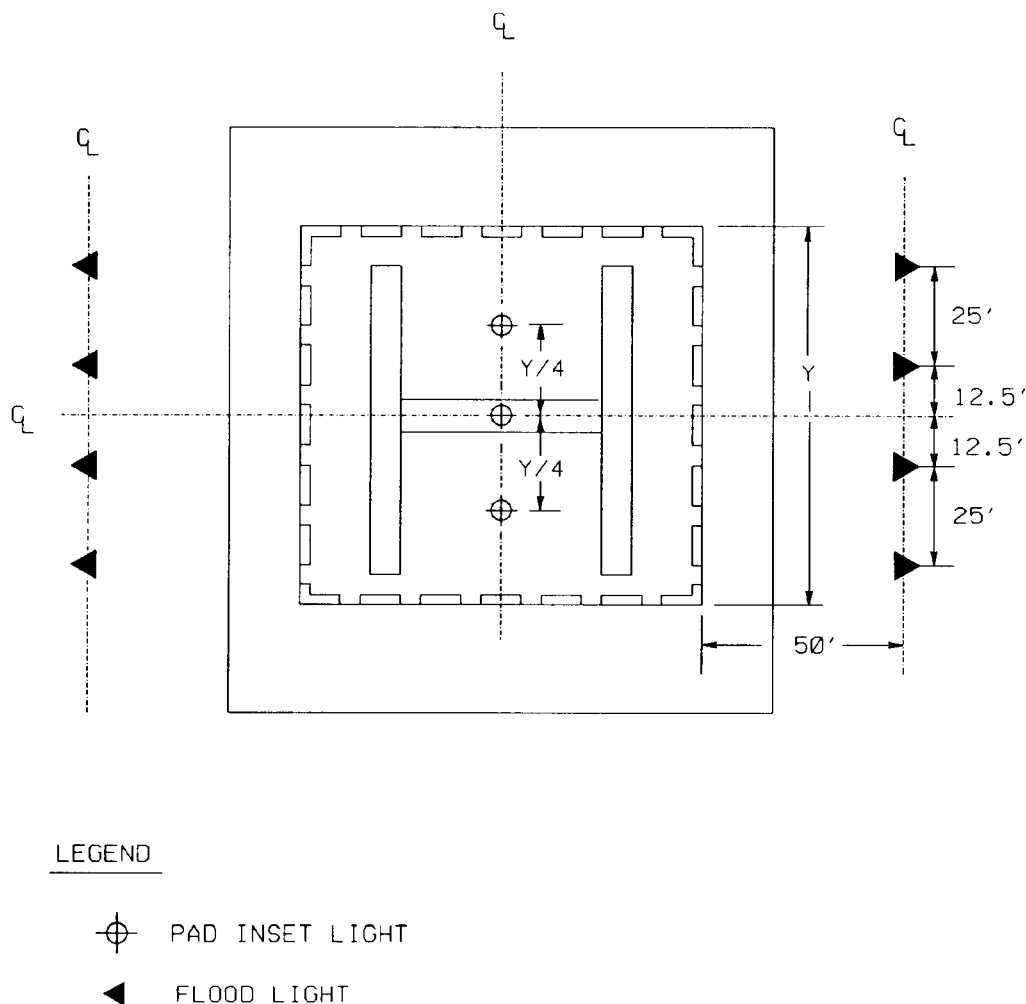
Layout of optional floodlights and inset lighting fixtures.
